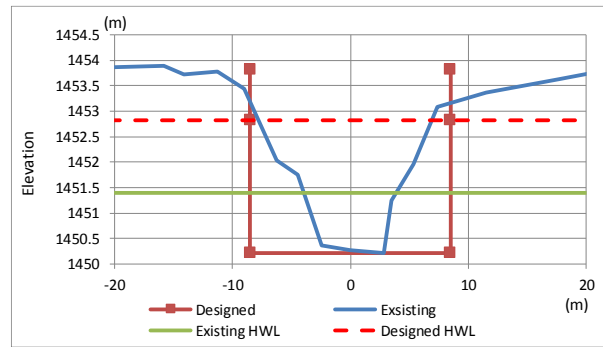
Designed Cross Section at Bridge No.3 (Punyamati Khola)
